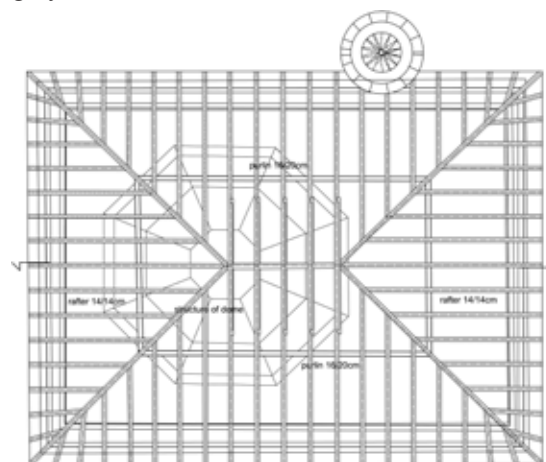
Plan of the secondary structure of the newly-designed roof by CHwB [http://www.chwb.org/regional/documents/The_Handanija_Mosque_Restoration.pdf].
